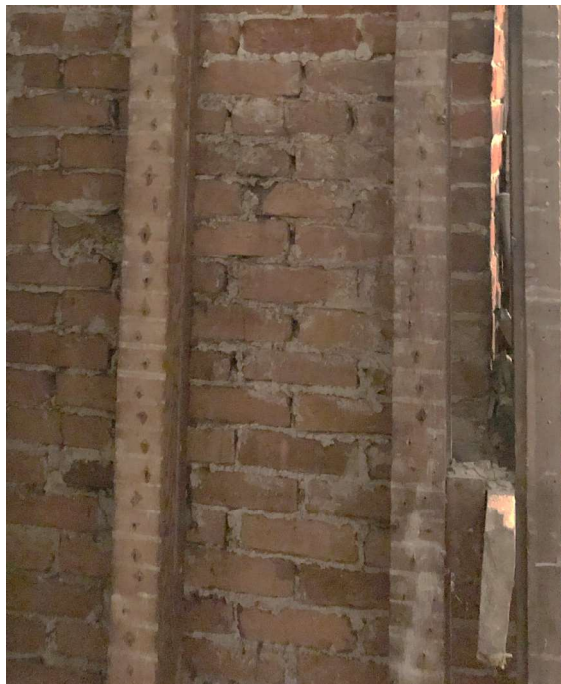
Image of striped interior wall in Porters House, showing lighter uniform studs with nail marks showing utilization of lighter balloon style framing methods (Image from applicant)
